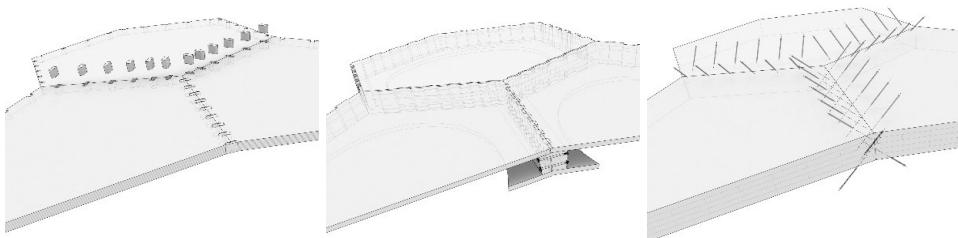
Three different segmented timber shell structure prototypes. Left: a single solid plate made from laminated veneer lumber (LVL) with dovetail plug joints. Middle: a hollow cassette with edge beams and a hole in the bottom plate. Right: a CLT-based plate system with crossing screw connections and no integral joints (Image by ICD/ITKE/LBP University of Stuttgart).
